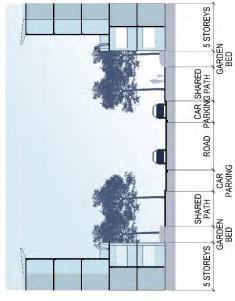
Central Streets (Plan Extract and Indicative Section)
